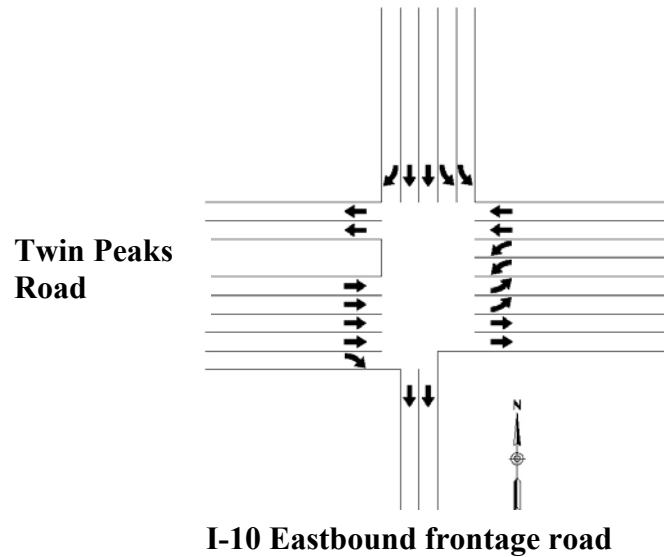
Proposed Twin Peaks Road/Access Road Intersection Configuration
